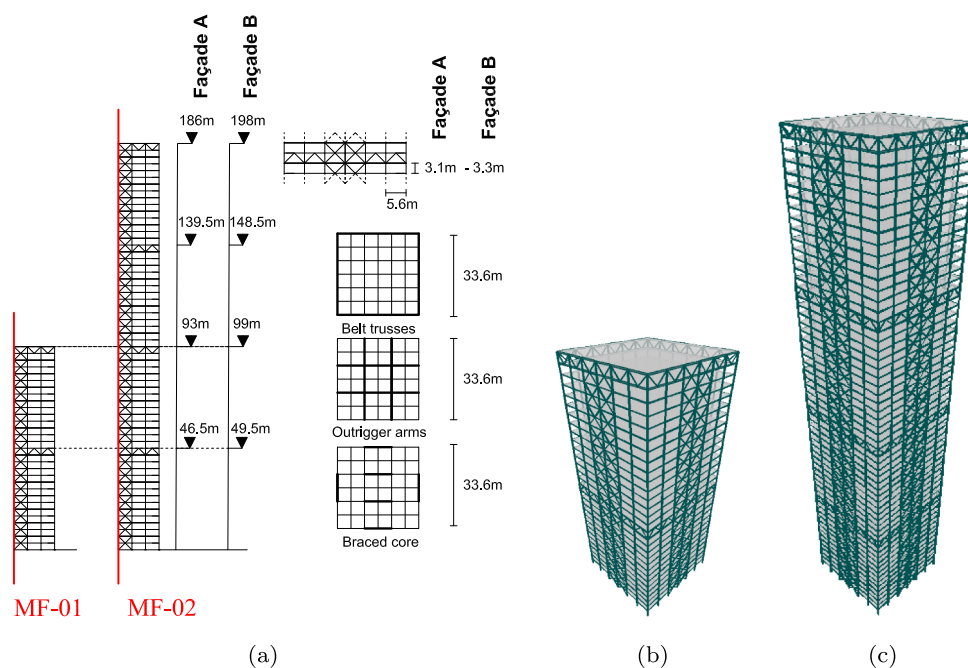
Case-study buildings: plan and section geometries (a), MF-01, thirty-storey frame b), MF-02, sixty-storey frame (c).
